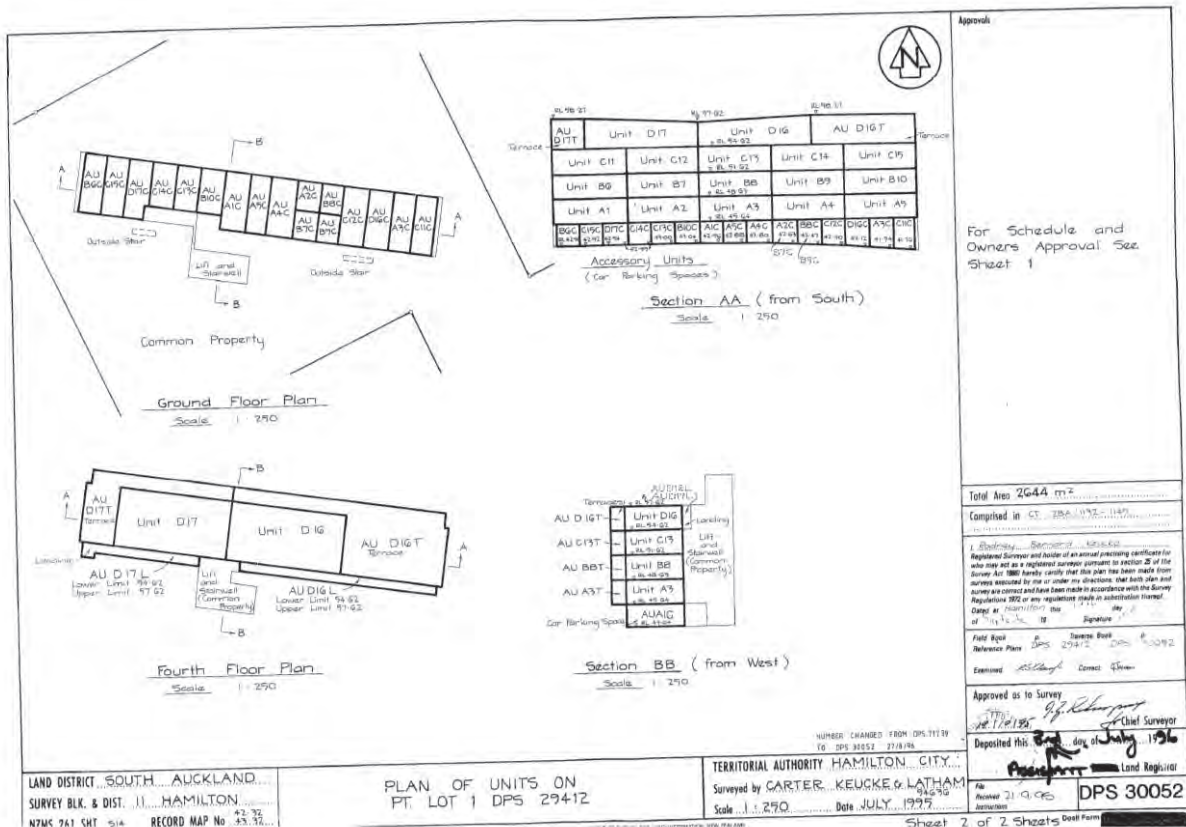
1995 survey plan showing the layout of the apartments at 89 Tristram Street. Source: LINZ, DPS 30052
